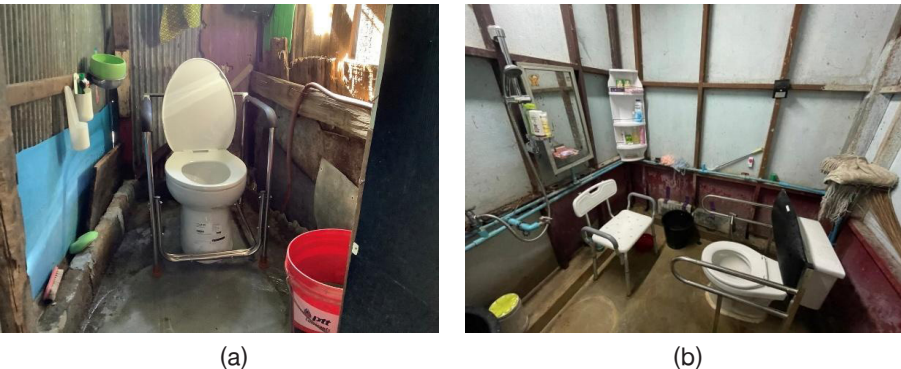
Handrail set covering the seated toilet: (a) the seated toilet with the handrail structure set placed on the evened floor in the south; and (b) a handrail set with a backrest in the central region house.
